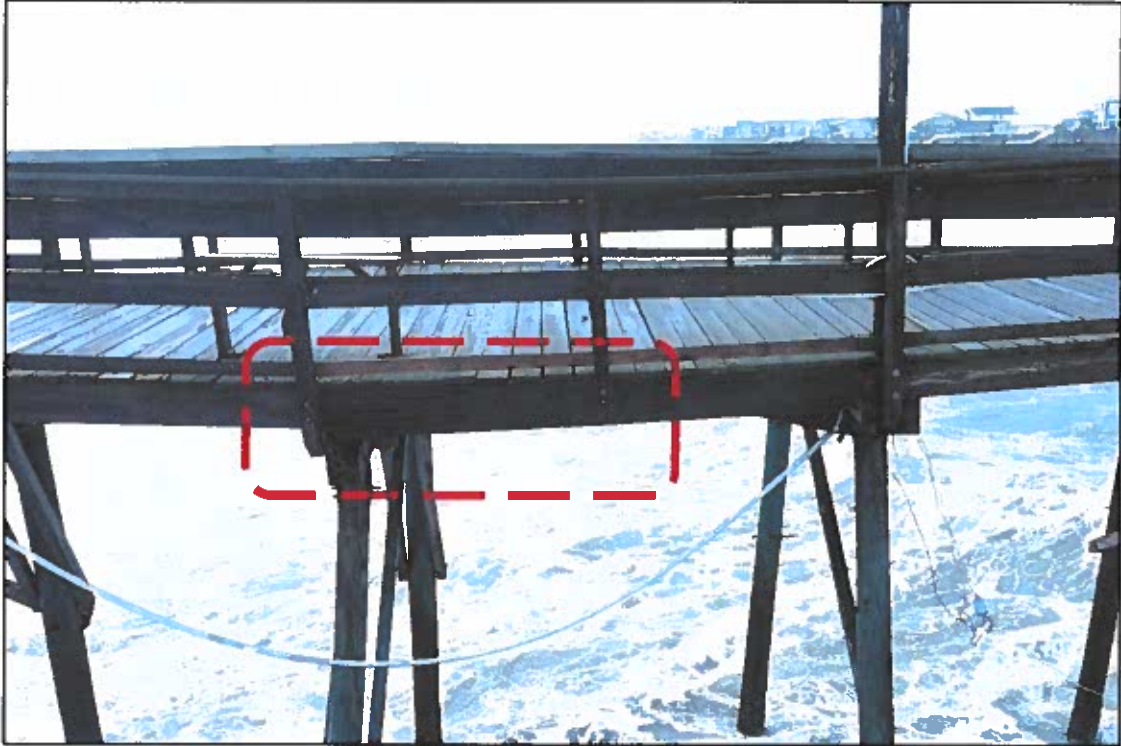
Pile 25B - Top 18-inch pile is broke/overstressed
